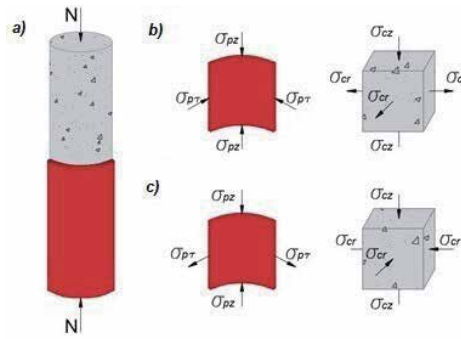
Tension of steel tube and concrete core of the central compressed CFST column: a – scheme of loading; b – at low loading levels; c – at high loading levels.
